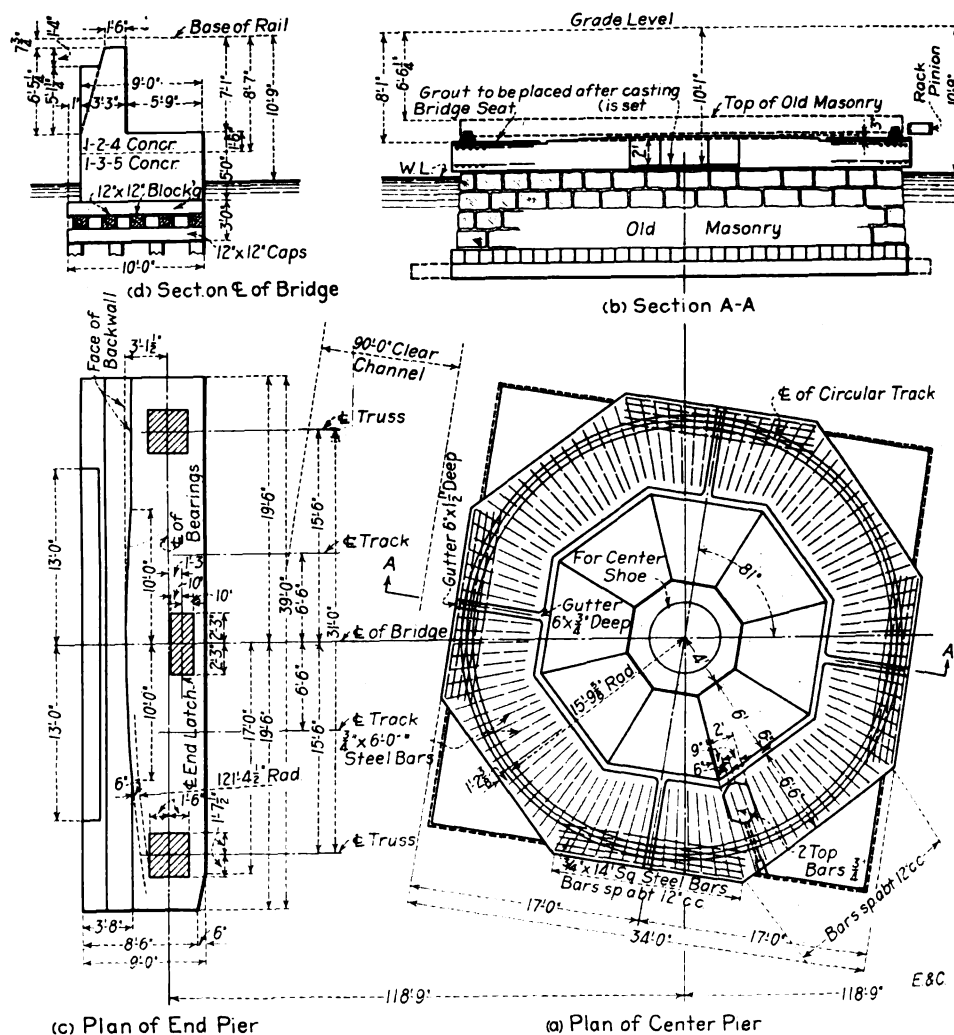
Plans and Elevations of End Piers and Top Portion of Pivot Pier of C. & N. W. Ry. Bridge, Milwaukee, Wis.
